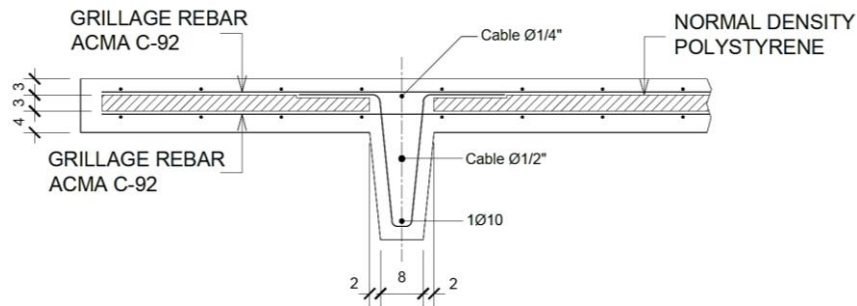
Cross-section and reinforcement layout of the cladding panel (units in cm).
